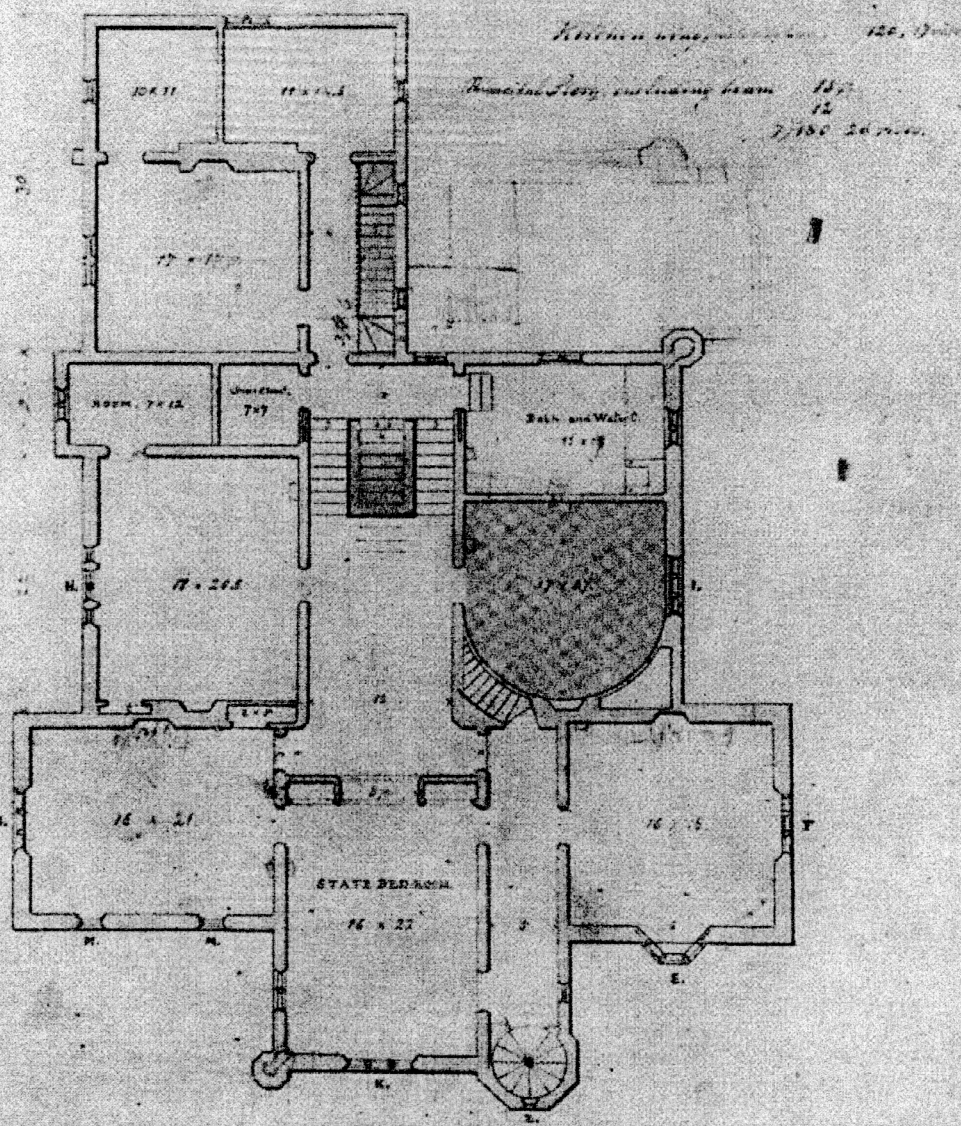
The second floor plan of the Harral House. The stair within the chamber on the right is not shown on the first floor. Whether is existed or not is unclear. From Golovin.
